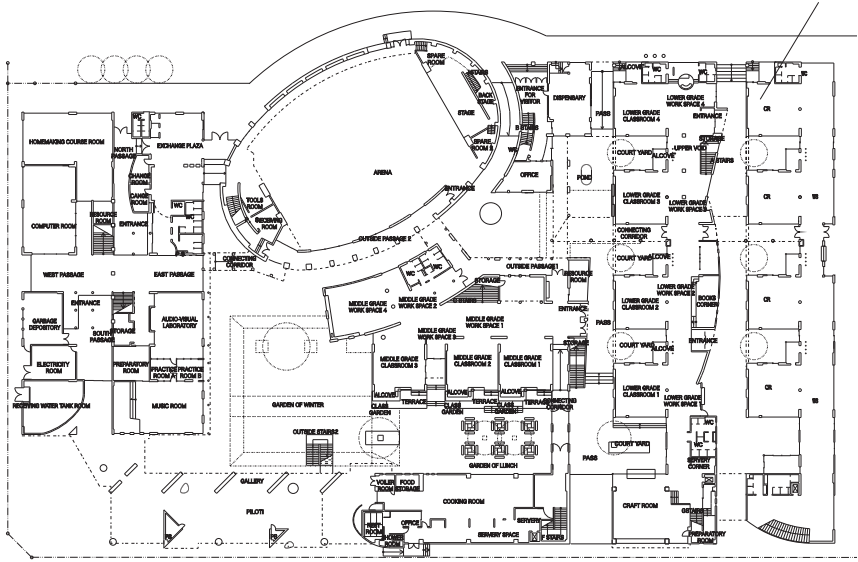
Ground floor plan of Utase Elementary School, Chiba.
